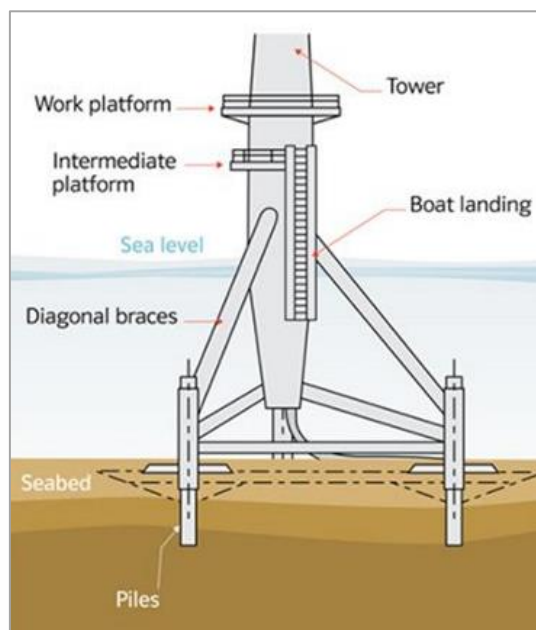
Typical tripod structure (4Coffshore, 2013)
